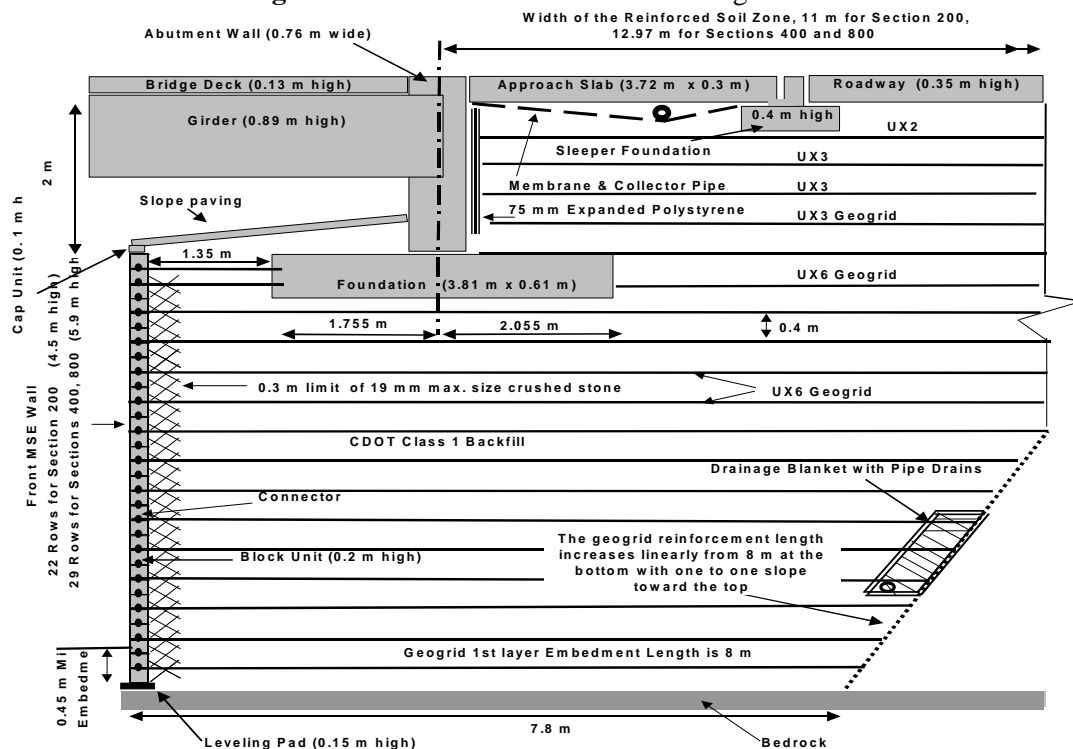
Cross-section view of Founders/Meadows GRS bridge abutment (Abu-Hejleh et al. 2002).
